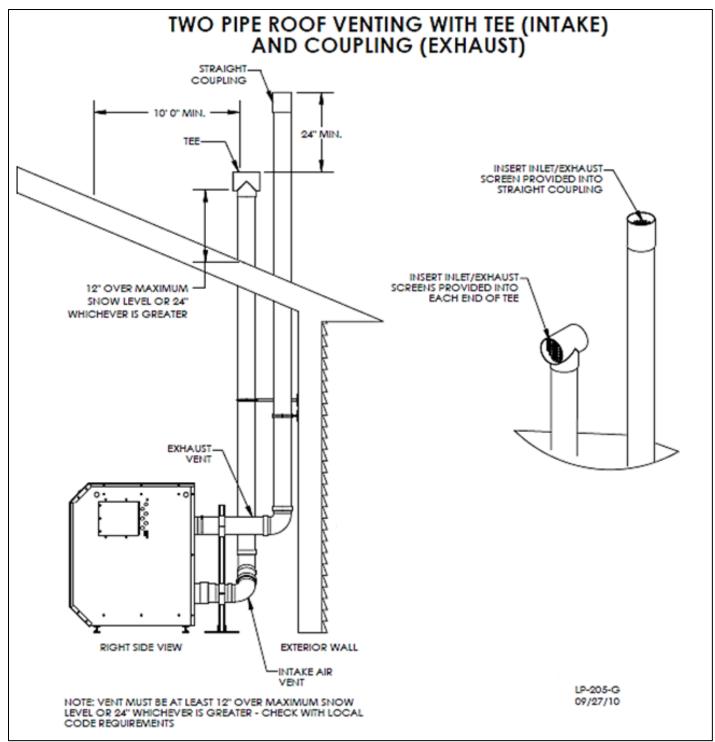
Two Pipe Roof Venting with Tee and Coupling
